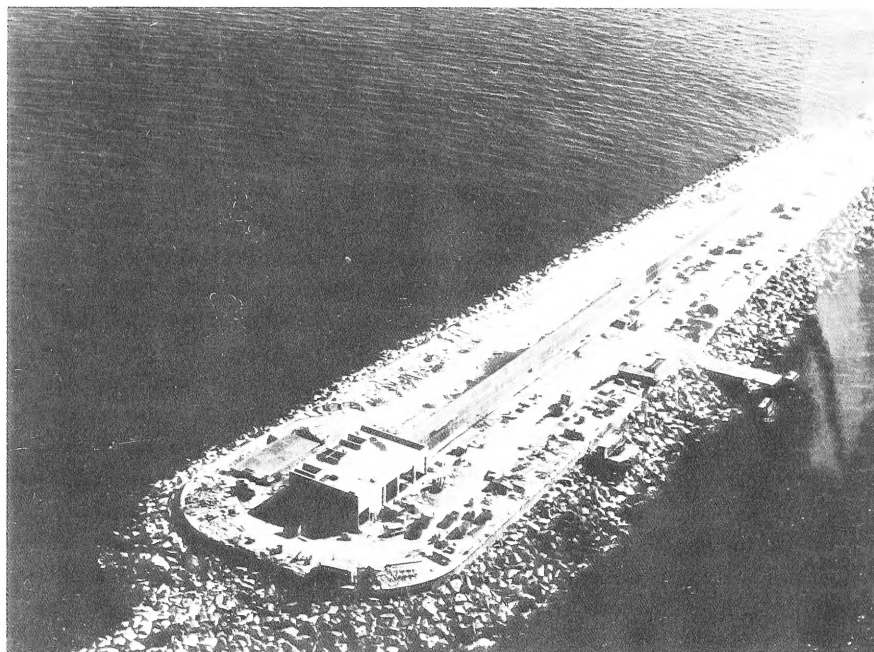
Aerial oblique view of Portal Island No. 1 from northwest.
